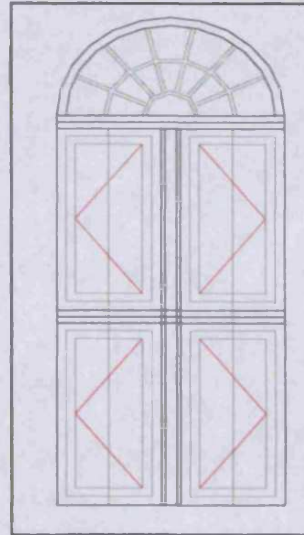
Window shape picture as it appeared in adobe building and in Cad drawing
